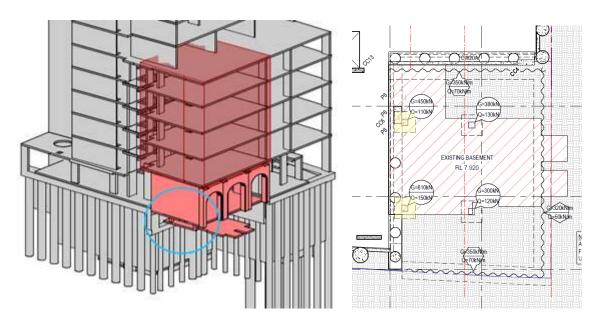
Extract of an Axonometric Diagram and Basement Floor Plan from the Structural Report prepared by Van Der Meer
